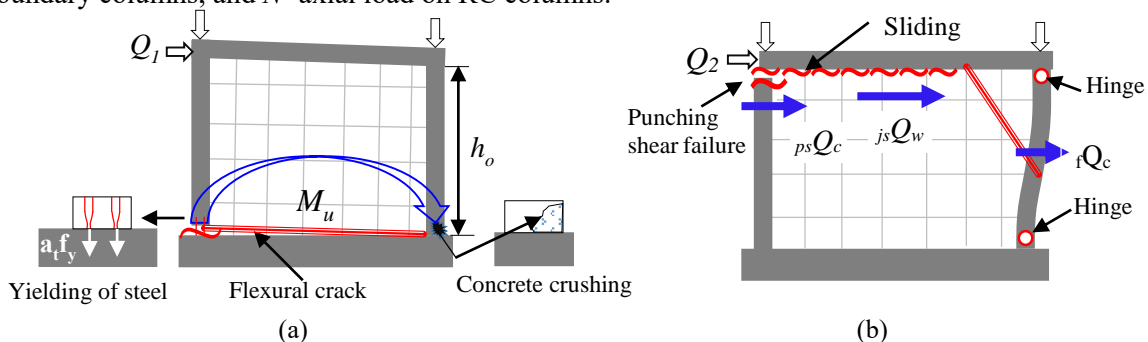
Load transfer mechanism of (a) Flexural yielding of frame (Failure I) and (b) Column punching and joint failure (Failure II)
